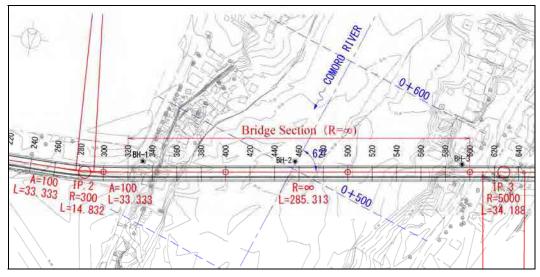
Horizontal Alignment around the Bridge Section
